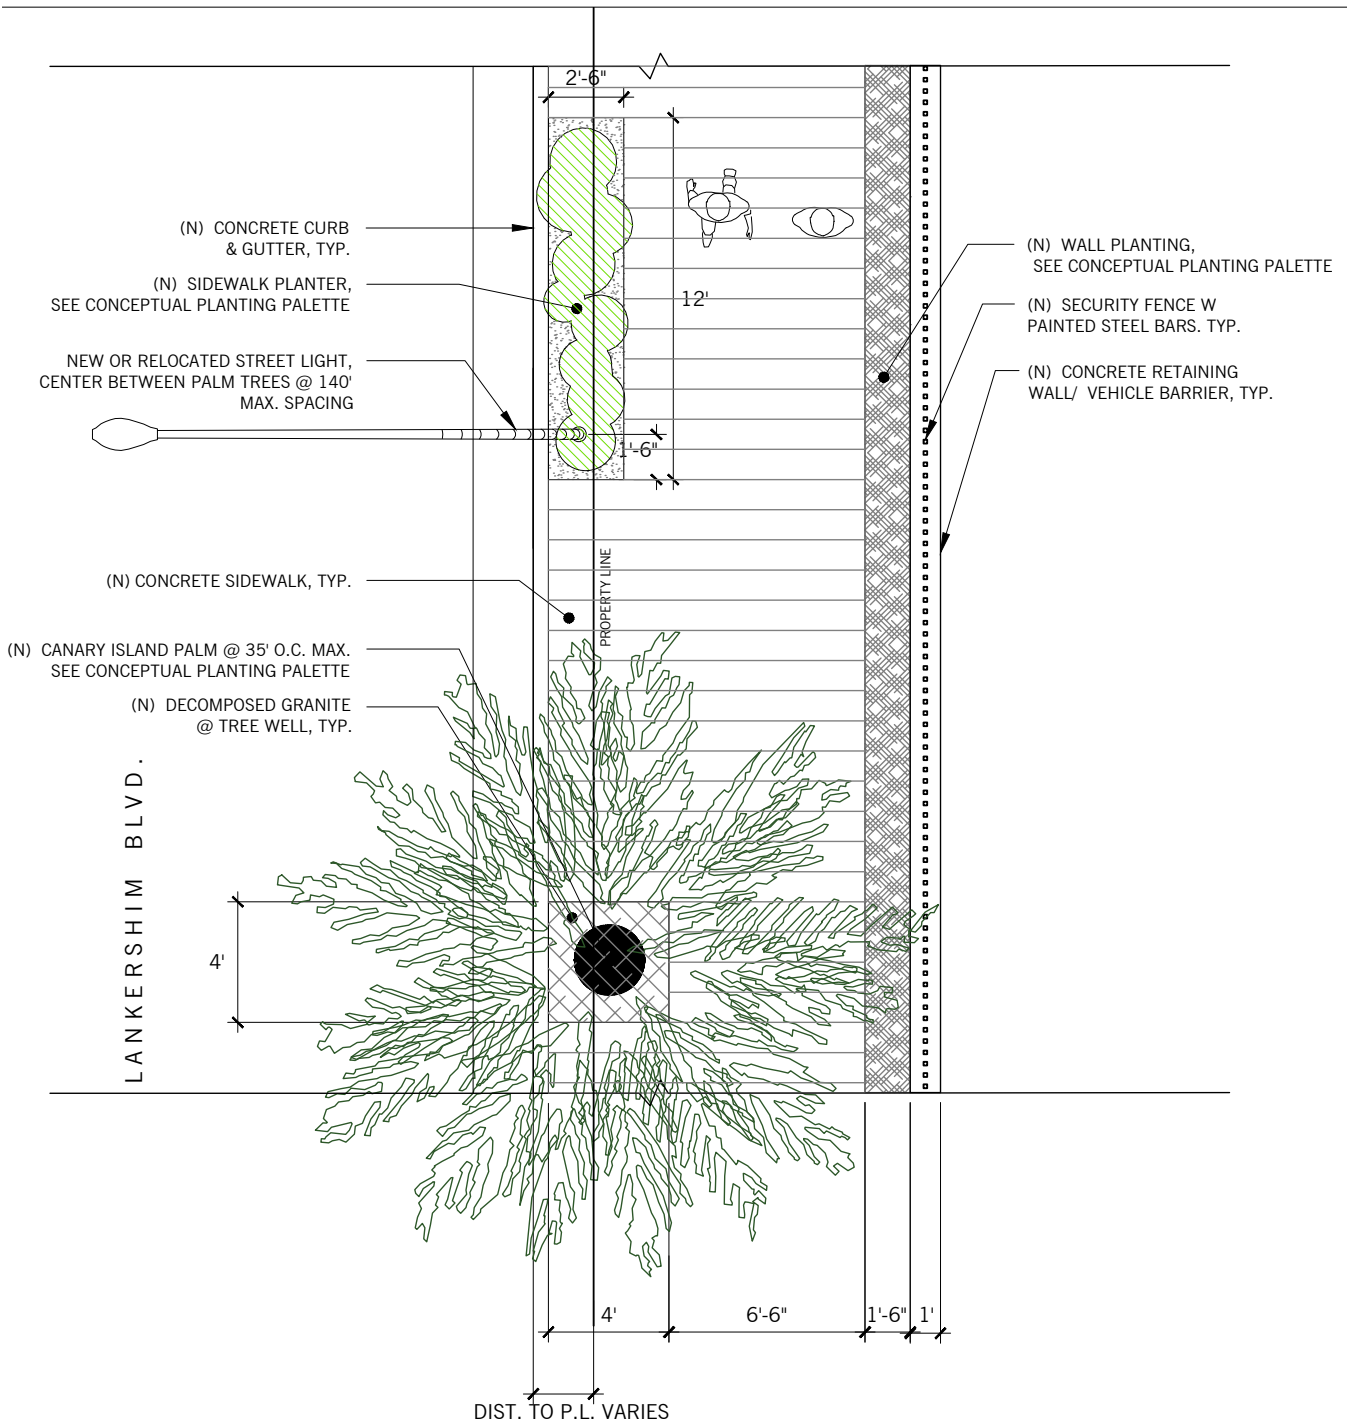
Conceptual Lankershim Streetscape Plan Typical Detail
